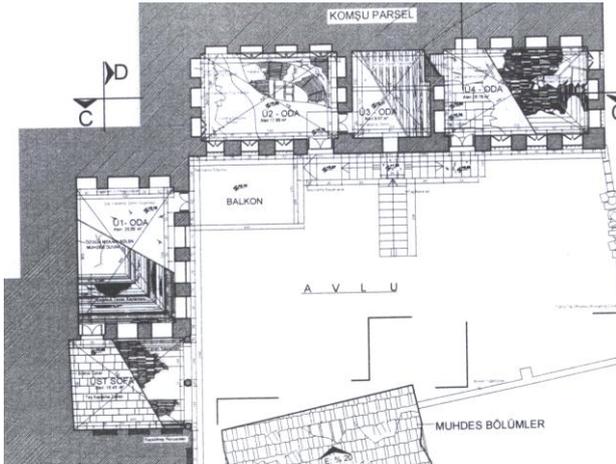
Ceiling and floor plan from province Gaziantep, Turkey. Hüseyin Enc House second floor plan.
